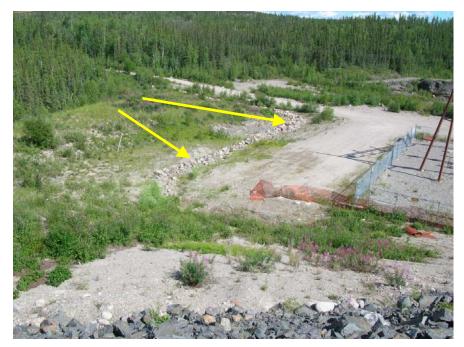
Strutt Lake Dam - rock fill French drain between downstream toe and
